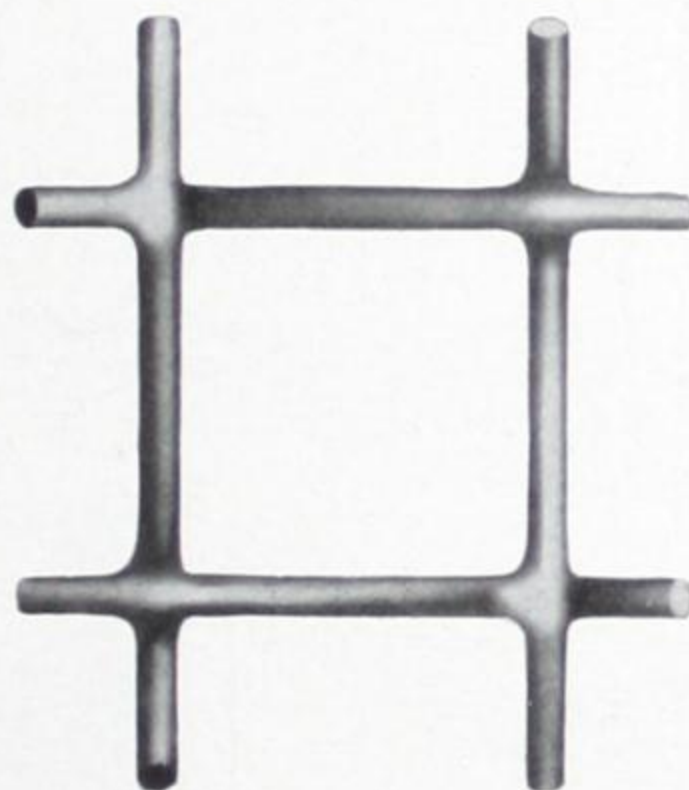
"Jersey" Galvanized Wire Cloth, 1 in. mesh, size 12-.105 in. diameter wire (actual size) used between wood-planking footwalks
